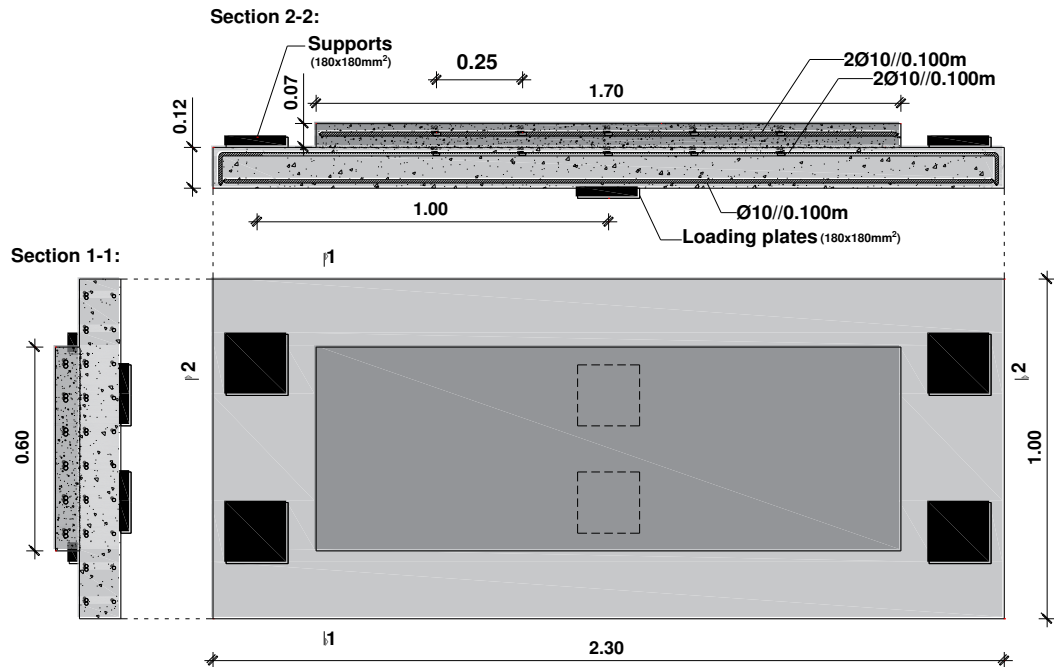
Rebar detailing and strain gauge placing for reference specimens (RL-REF).
